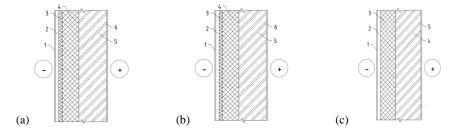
Structural solutions for walls: (a) rock wool; (b) polystyrene foam sheets; (c) spray-applied polyurethane foam: (a) 1 - External finishing layer; 2 - Ventilated air gap, 30 mm; 3 - Wind barrier; 4 - Thermal insulation with PAROC FAS B; 5 - Brick wall; 6 - Finishing layer (izoputos.lt); (b) 1 - External finishing layer; 2 - Ventilated air gap, 30 mm; 3 - Wind barrier; 4 - Thermal insulation with EPS 70; 5 -
